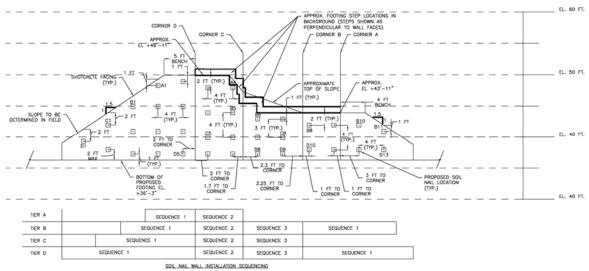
Soil nail lift sequencing drawing with soil nail elevation view.
